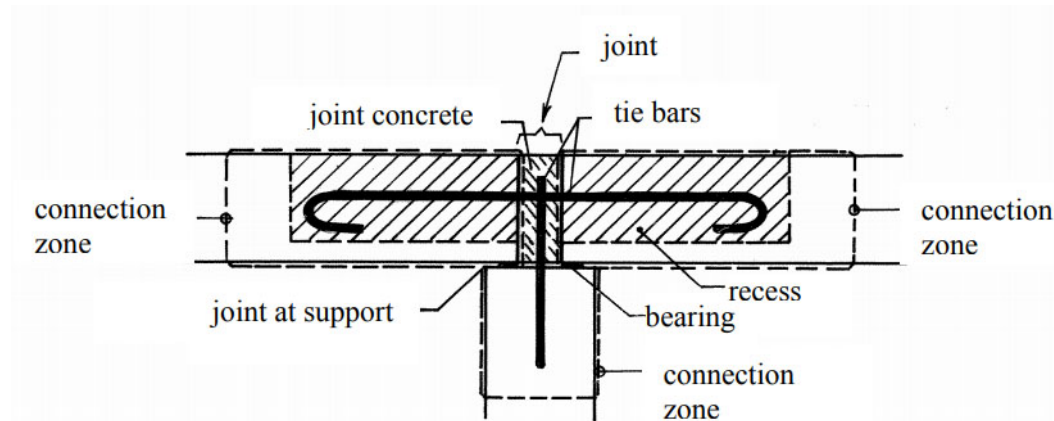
A structural connection consists normally of several components. (Engström, et al., 2008)
